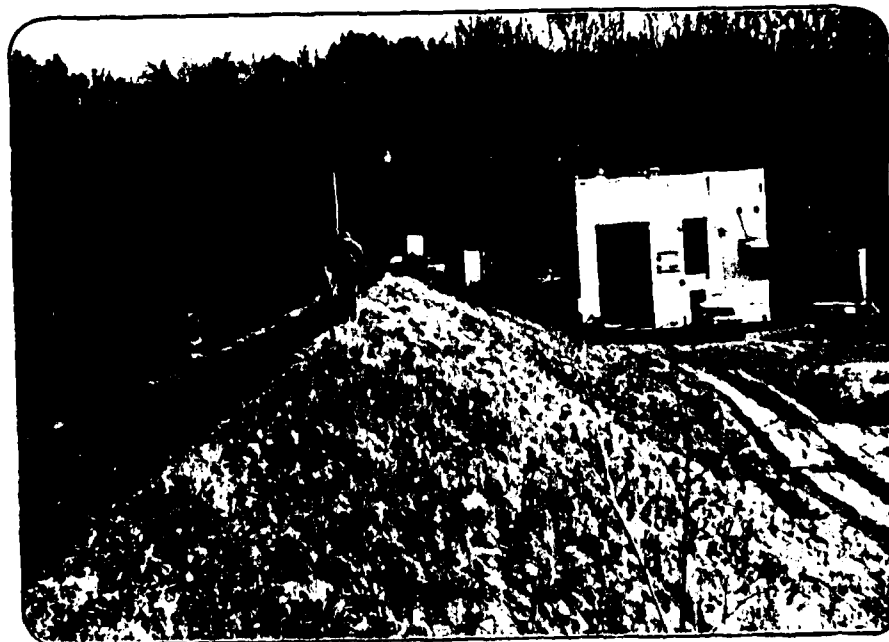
View of the Downstream Slope of the Dam from the Right Abutment
